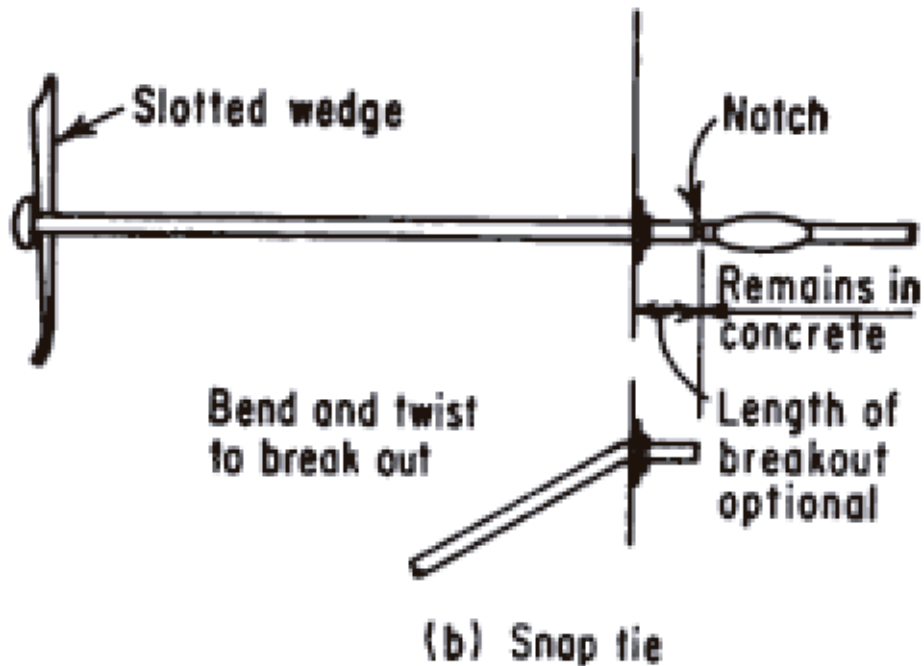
Snap tie for plywood formwork. Source: William S. La Londe. Ed. *Concrete Engineering Handbook* (New York: McGraw-Hill, 1961), 2-5
